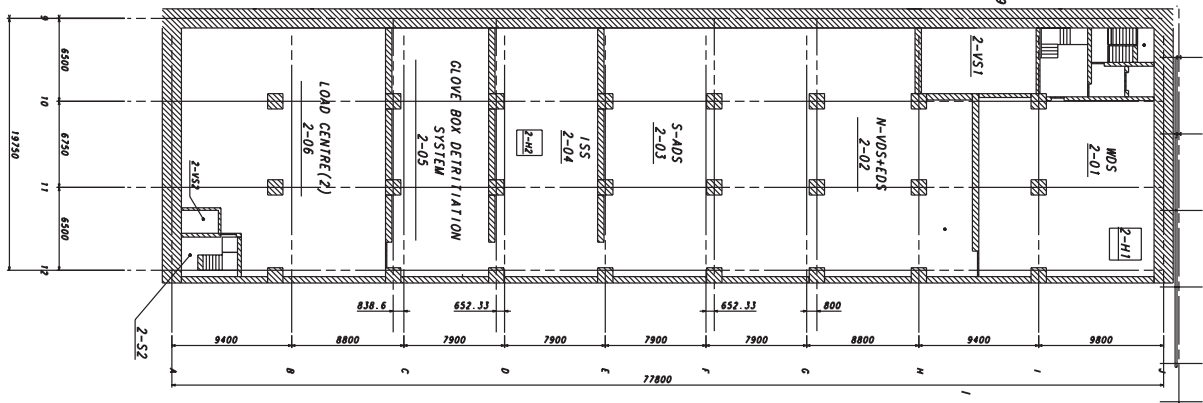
Tritium, Vacuum, Fuelling, and Services Building Plan View at Elevations: - 11.6 m , - 7.0 m, 0.0 m and + 7.0 m
